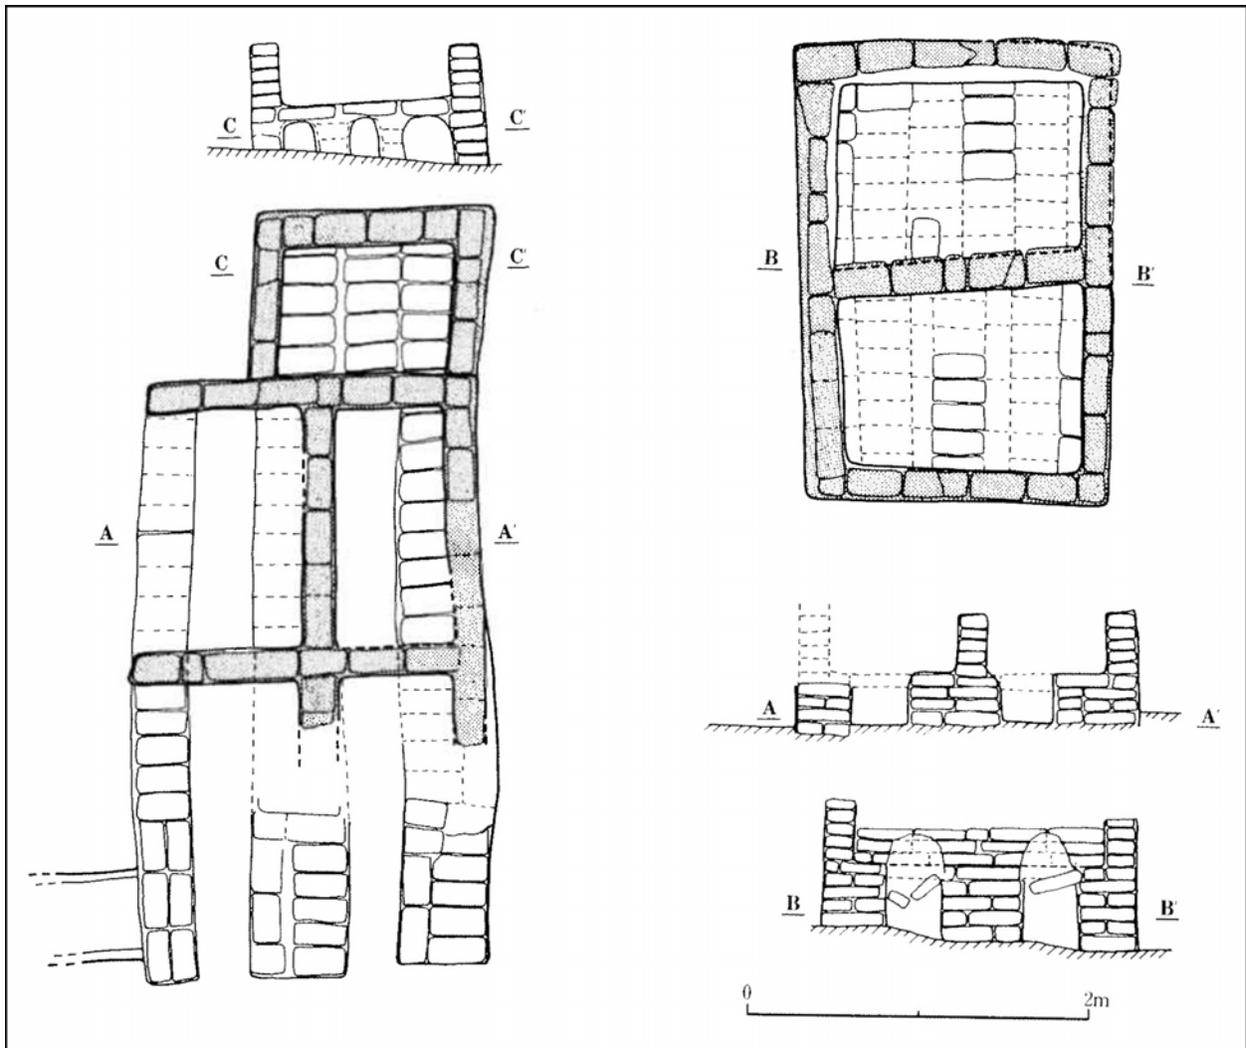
Tell Gubba. Plans (bottom left, top right) and sections (top left, bottom right) showing two structures with parallel wall foundations. (After Odani and Ii 1981: Fig. 9)
